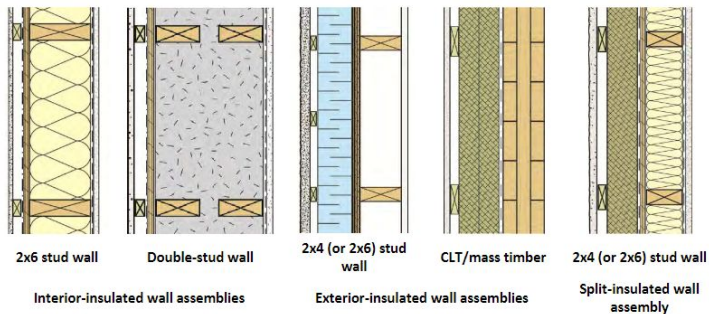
Options for placement of insulation within thermally efficient above-grade wood-frame wall assemblies.
